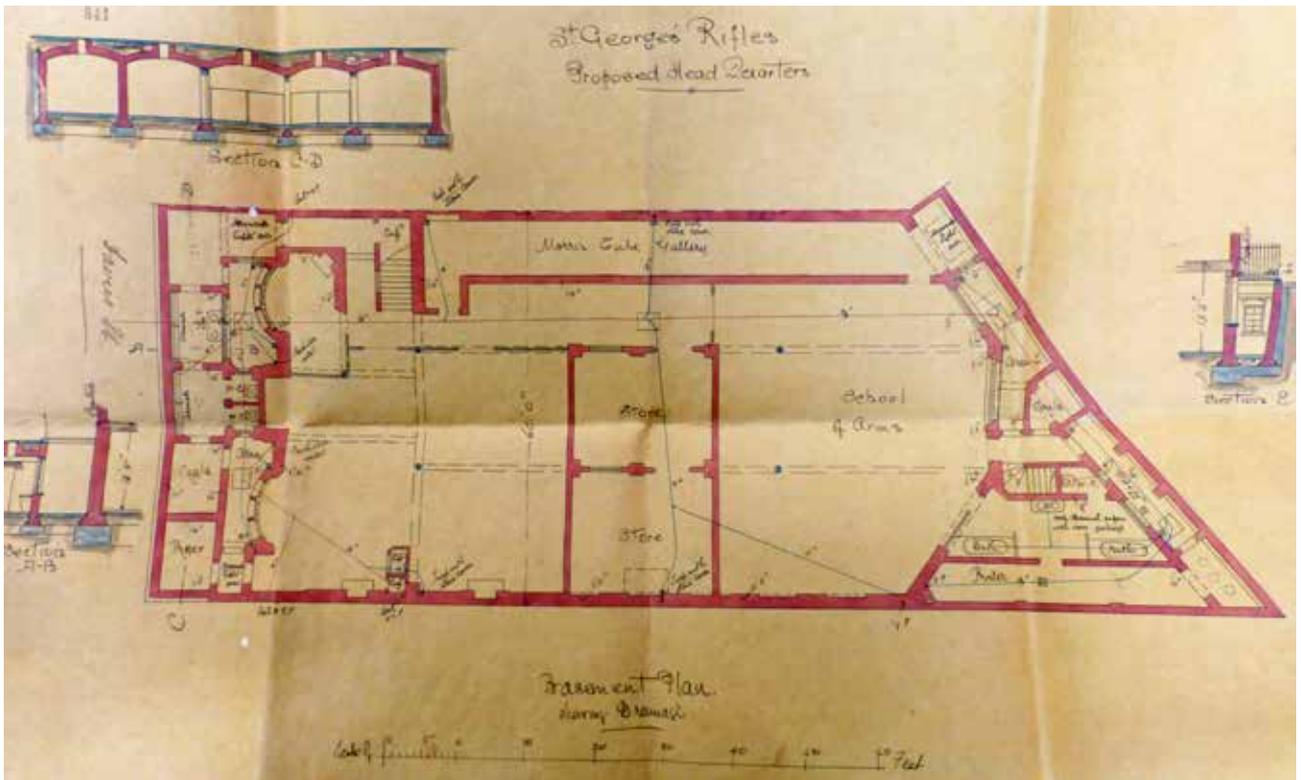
Basement plan of 56 Davies Street showing proposed layout and uses, drawn by Charles Herbert Shoppee, 1889 (Westminster Archive).
